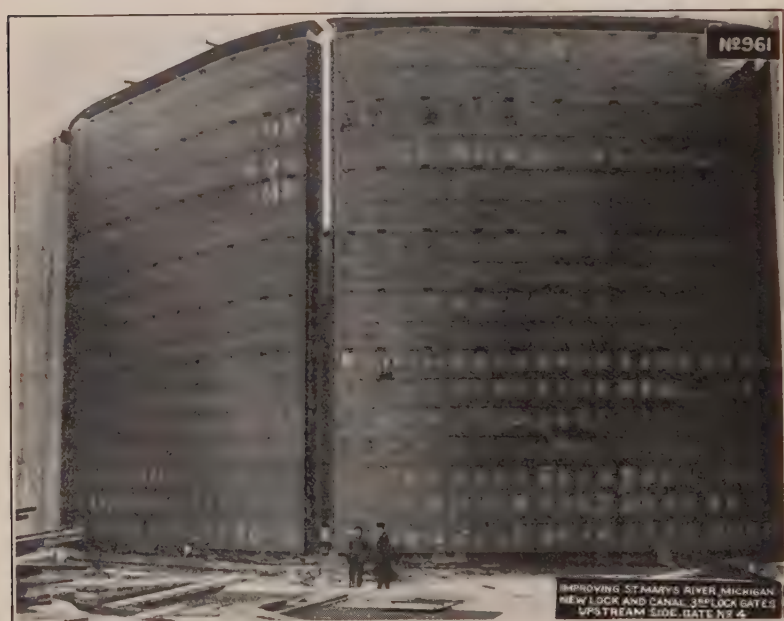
The steel lock-gates for the new lock at the "Soo" Canal, Michigan.
